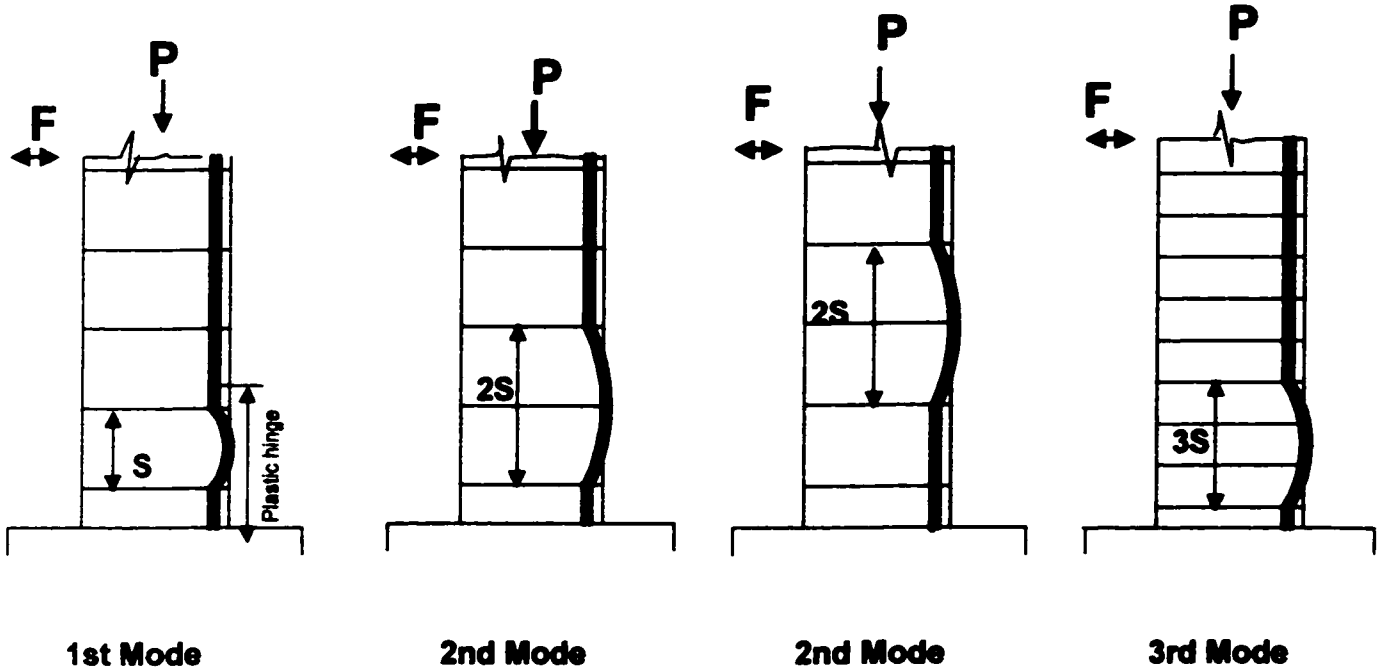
3: Different buckling mode shapes of longitudinal steel bars in concrete columns.
